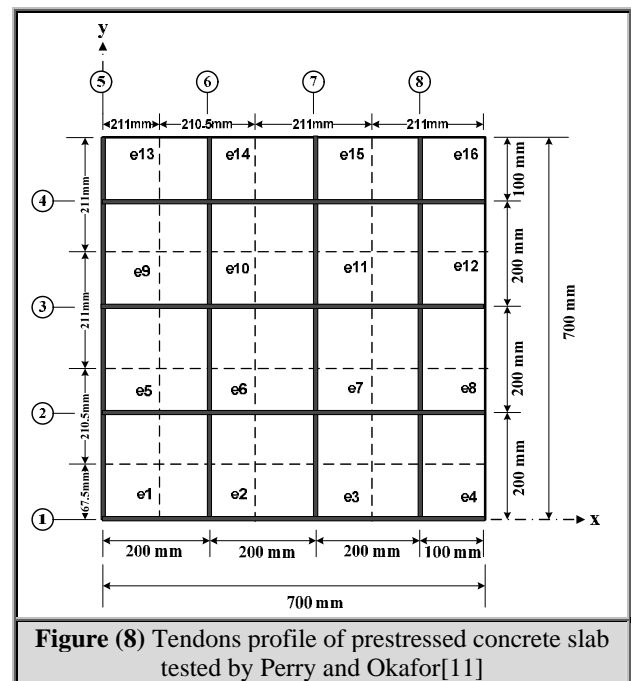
Tendons profile of prestressed concrete slab tested by Perry and Okafor[11]
